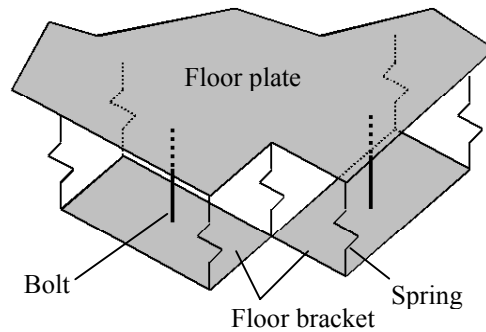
Isometric view of a corner joint (with column removed) showing locations of contact springs.
